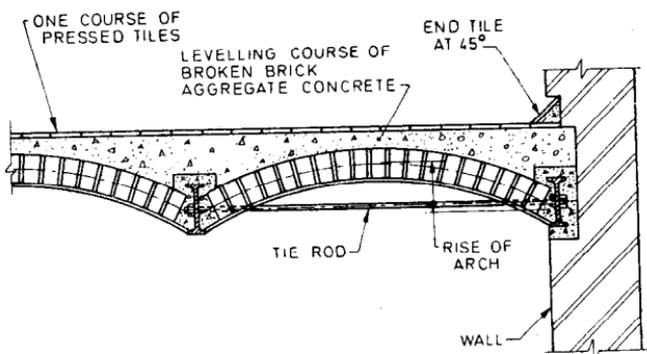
TYPICAL DETAILS SHOWING THE METHOD OF LAYING ONE COURSE OF PRESSED TILES FOR ROOF
